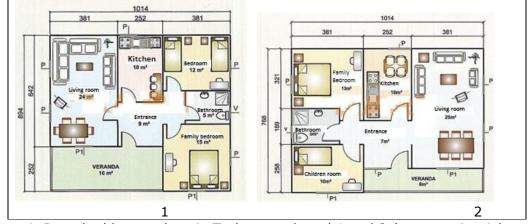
Detached house plans in Turkey numbered 1 and 2 (www.yeniprojeler.com)
